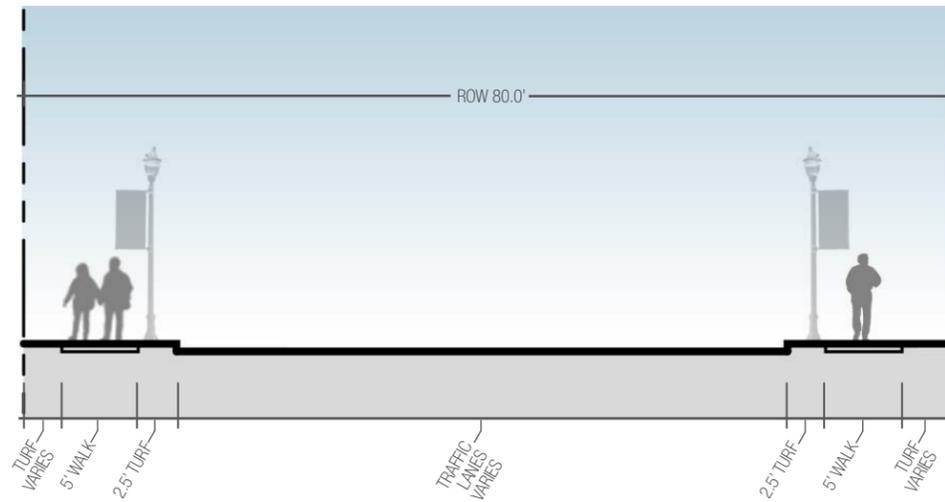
PROPOSED ANTIOCH ROAD 80.0' ROW SECTION A-A'
